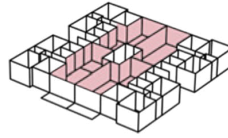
A typical floor plan in Harish. (Illustrated by the author)
